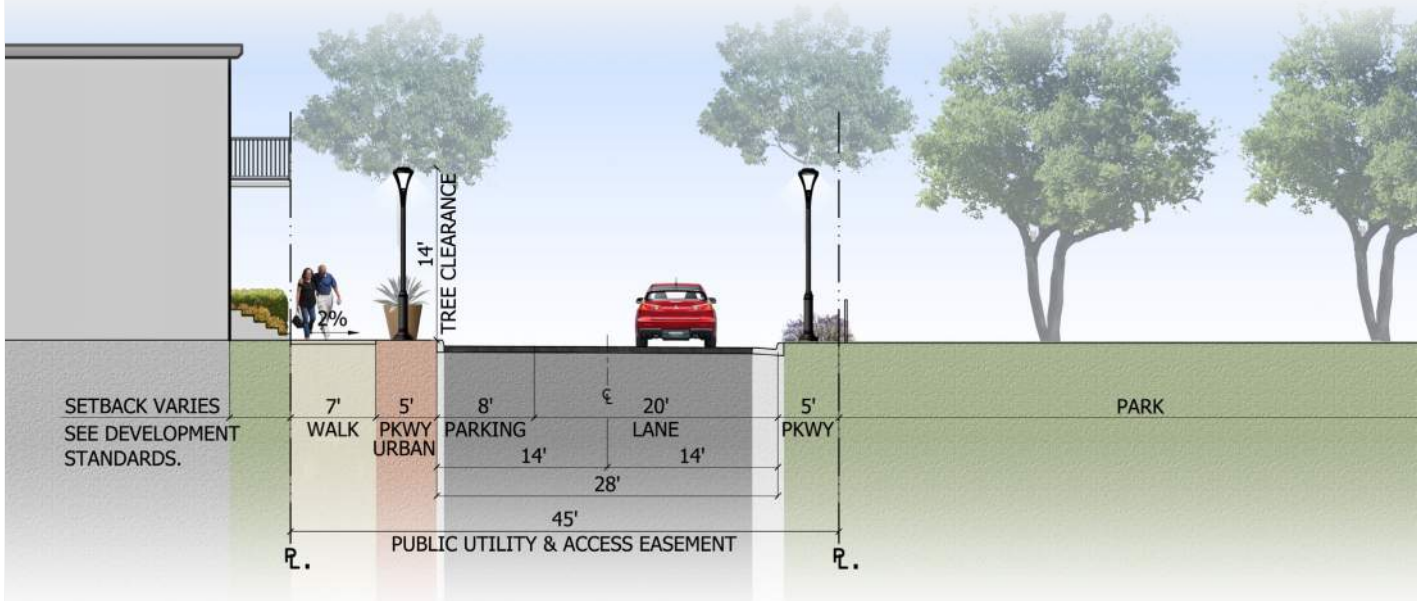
Street Section – Altair Vista One Way (Private, TTM lot K)
